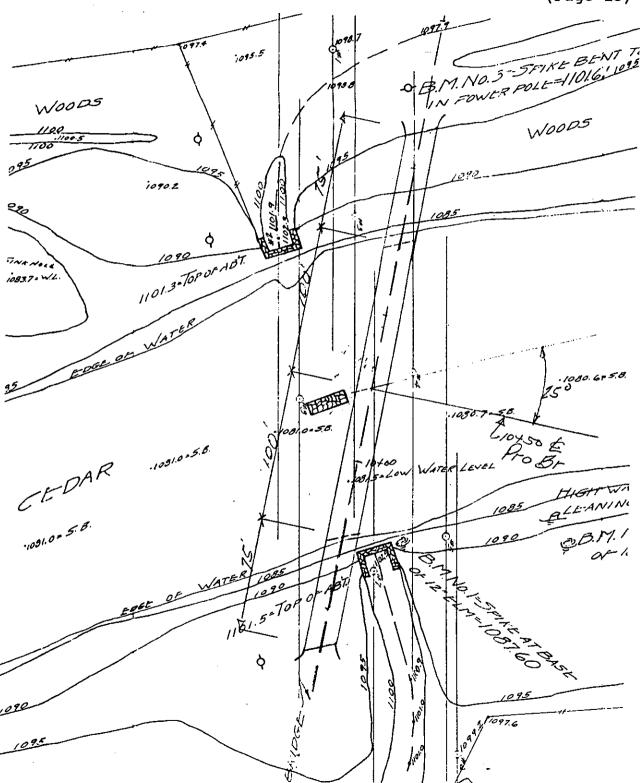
From design plan: An untitled topographic map of the new proposed bridge site.
